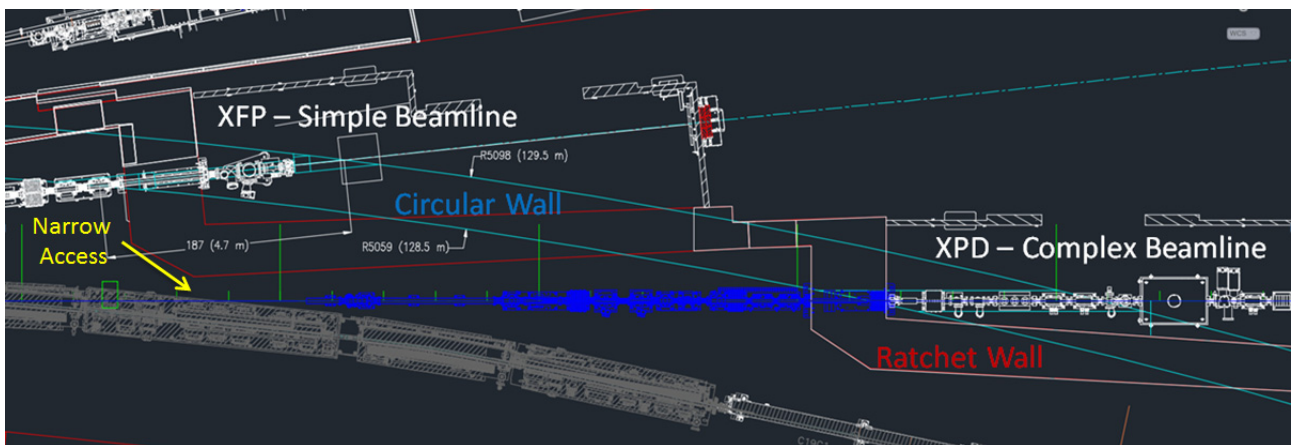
Existing adjacent beamlines at NSLS-II, with ideal circular wall outline overlay.
